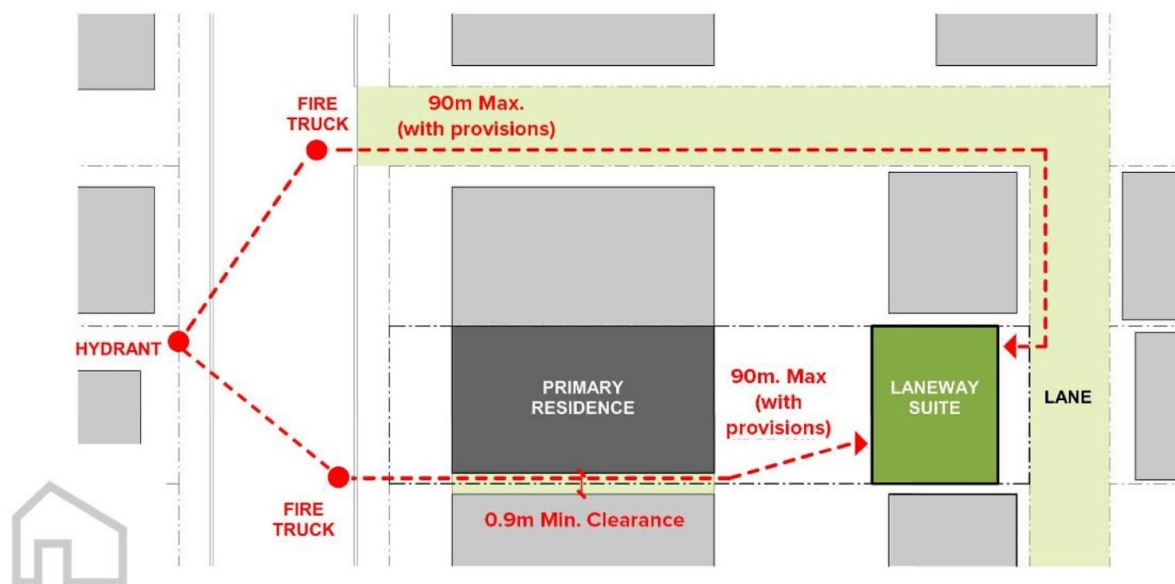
An illustration of emergency access recommendations from September 2020 for laneway suites (Source: Lanescape, 2020).
